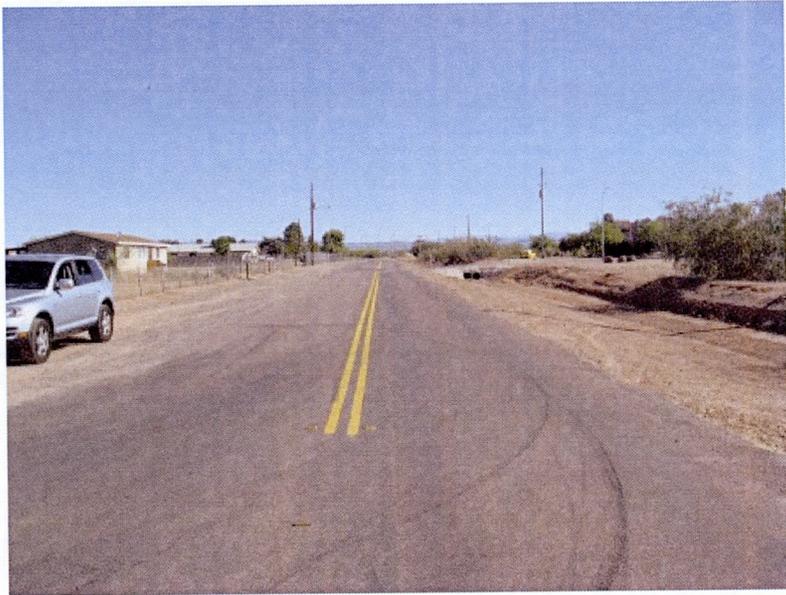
At intersection of Citrus Road and Enoch Drive looking north at Citrus Road.
